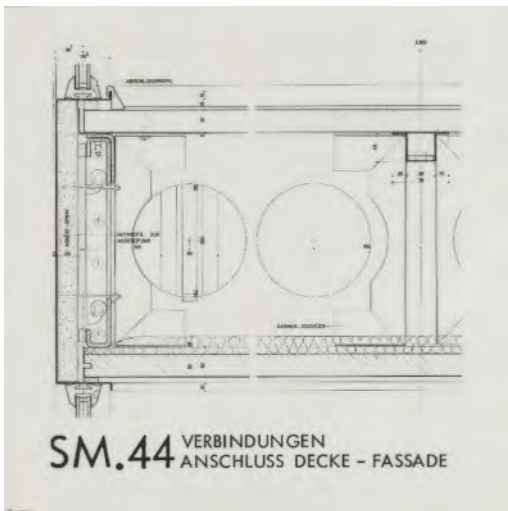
Typical section of the floor slab on the first floor – gta Archives/ETH Zurich, Fritz Haller.
